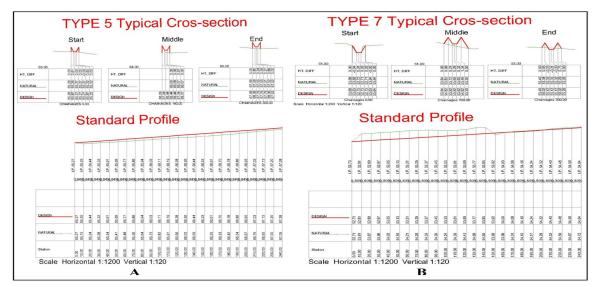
Part of typical cross-section. a. Standard profile for type 5 drainage, b. Standard profile for drain type 7.
